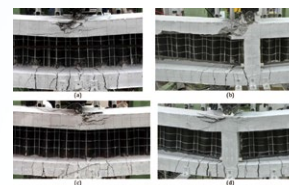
Plastic hinge zones: (a) Specimens B-1, (b) Specimens B-2, (c) Specimens B-3, and (d) Specimens B-4
